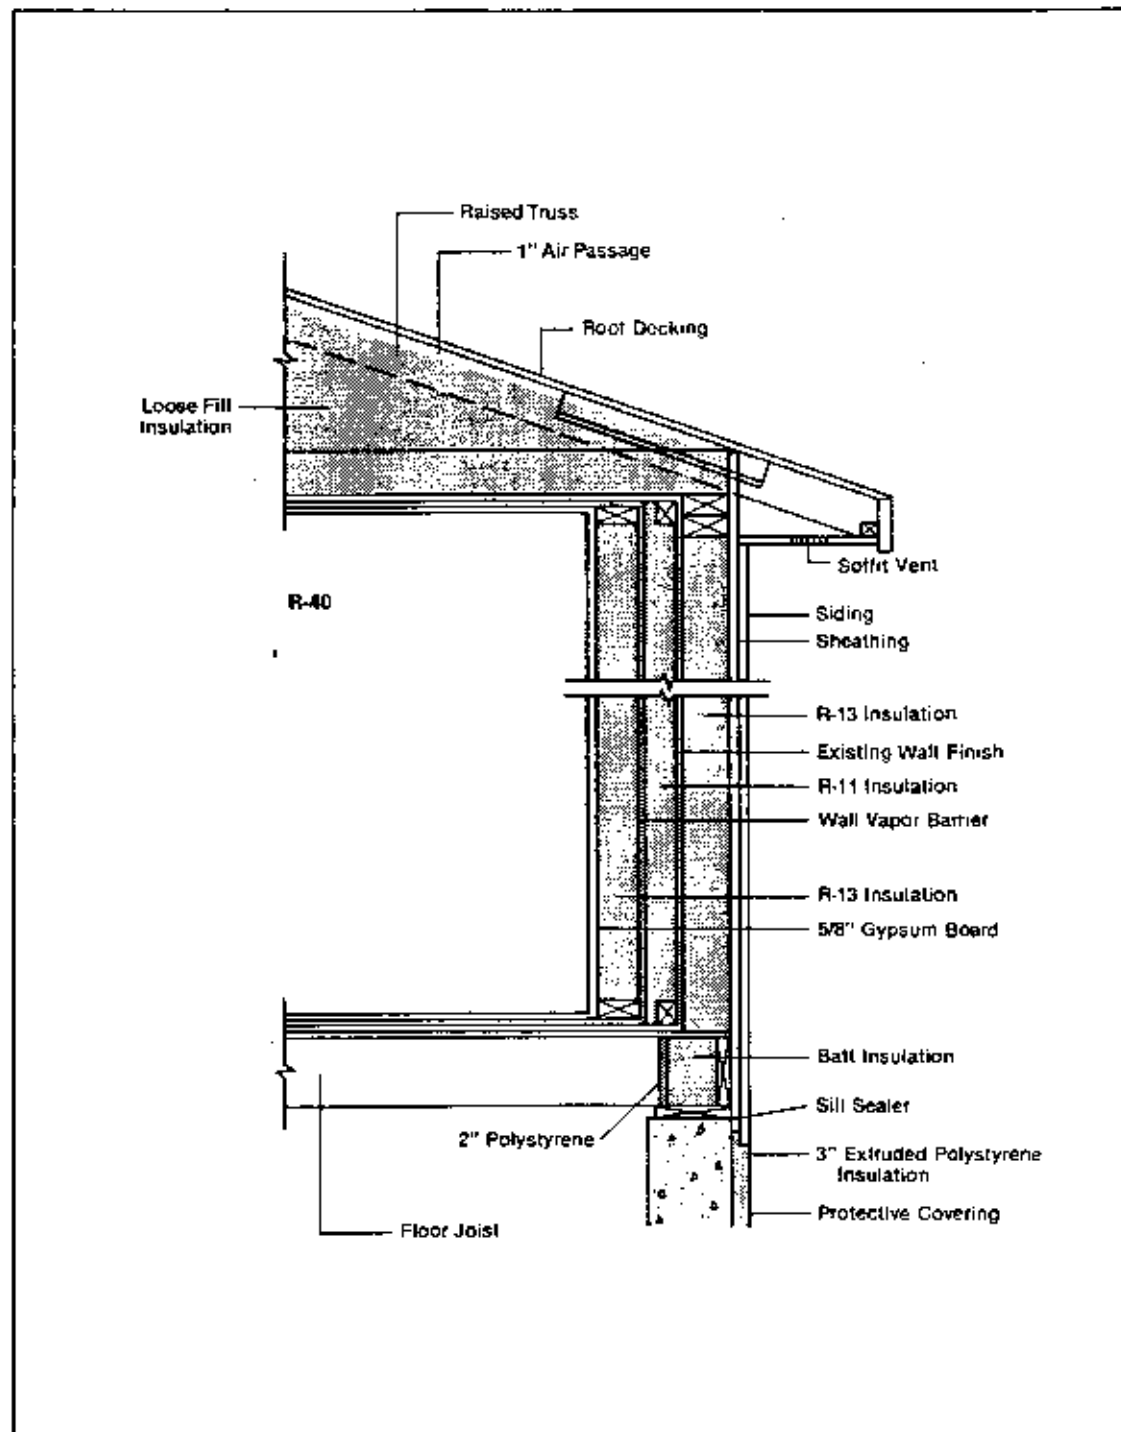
Retrofitting the interior of an existing house with previous 2 x 4 wall.
